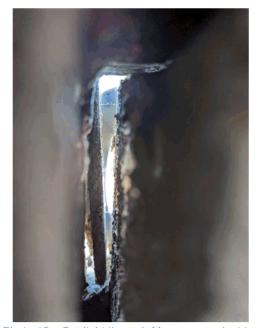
Daylight through Masonry crack at top of front wall
